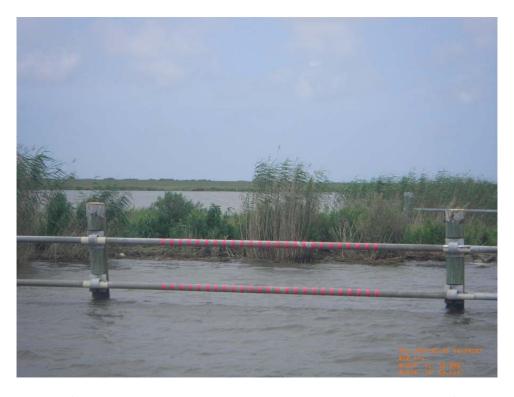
View of rock weir, barricade system and bank tie-in on the south side of Structure No.4.
